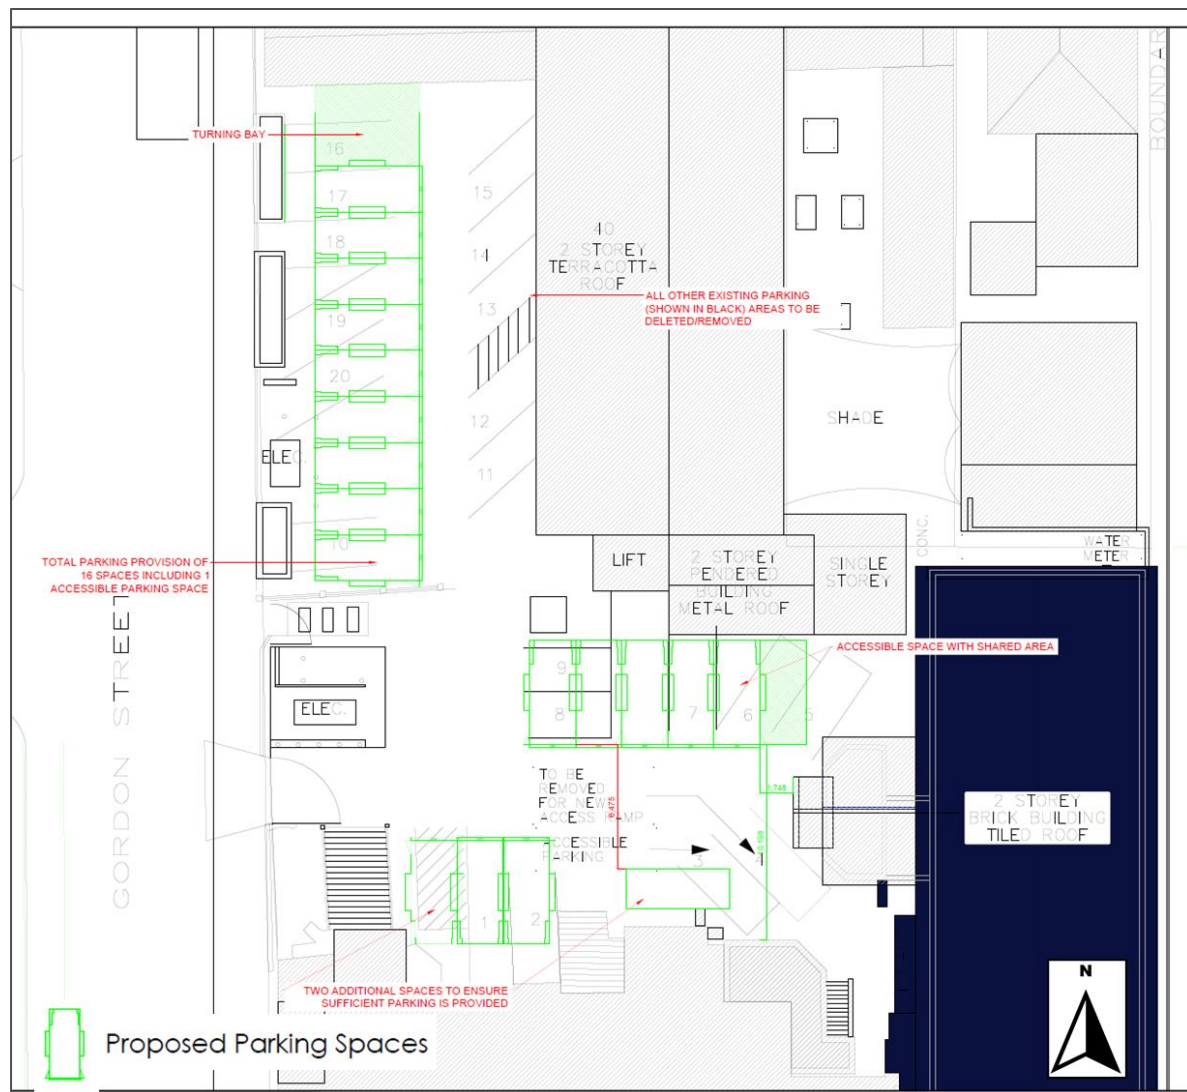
| Proposed car parking at the Gordon Street site (Source: Applicant's SRtS 2022)
